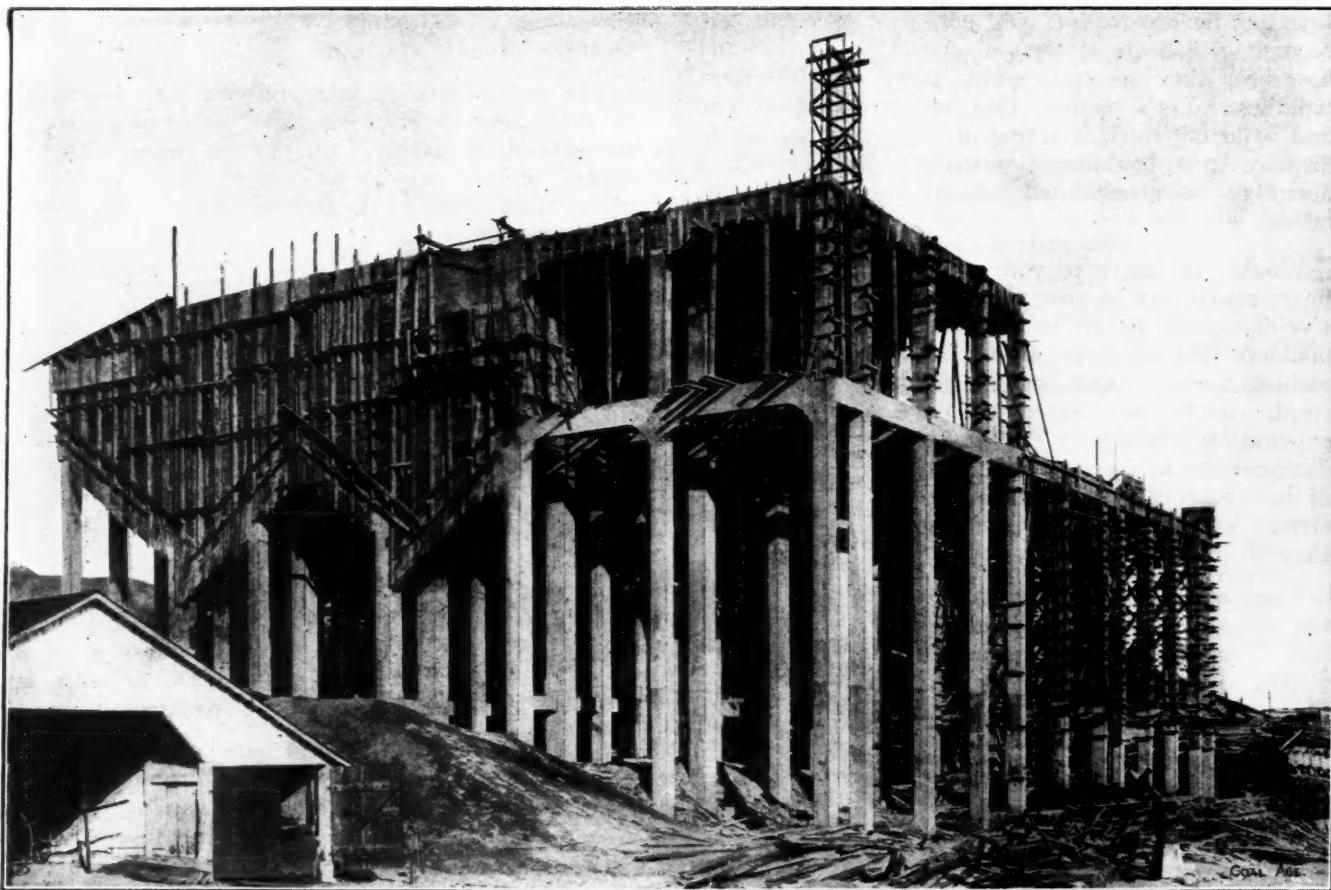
VIEW DURING CONSTRUCTION, SHOWING FORMS FOR CONCRETE
